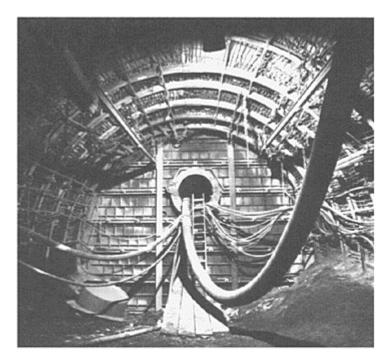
View at the face of the dam under construction from Heinrich Robert.
